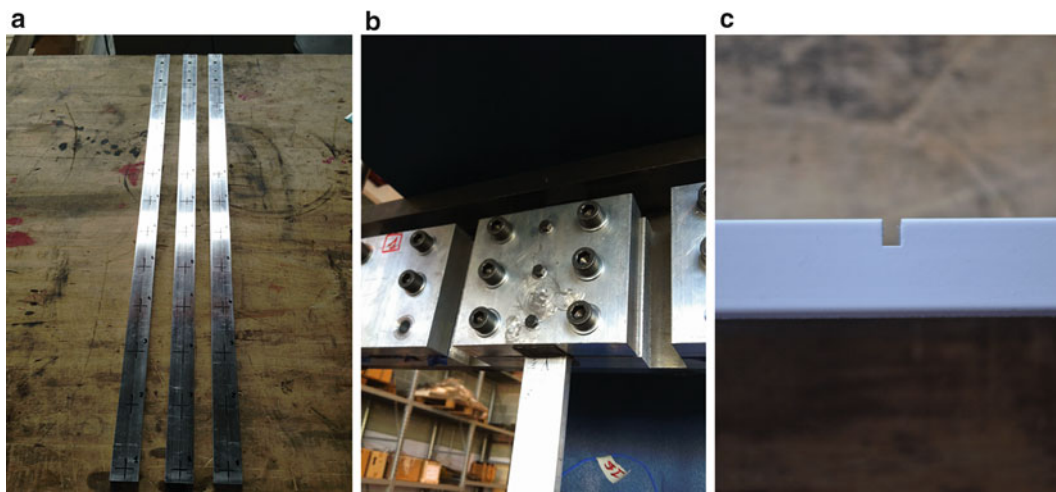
(a) Beams; (b) joint design; (c) damage example
